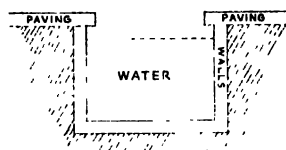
Upright walls and a paving surround that slightly overlaps the edge are best for a garden pool
